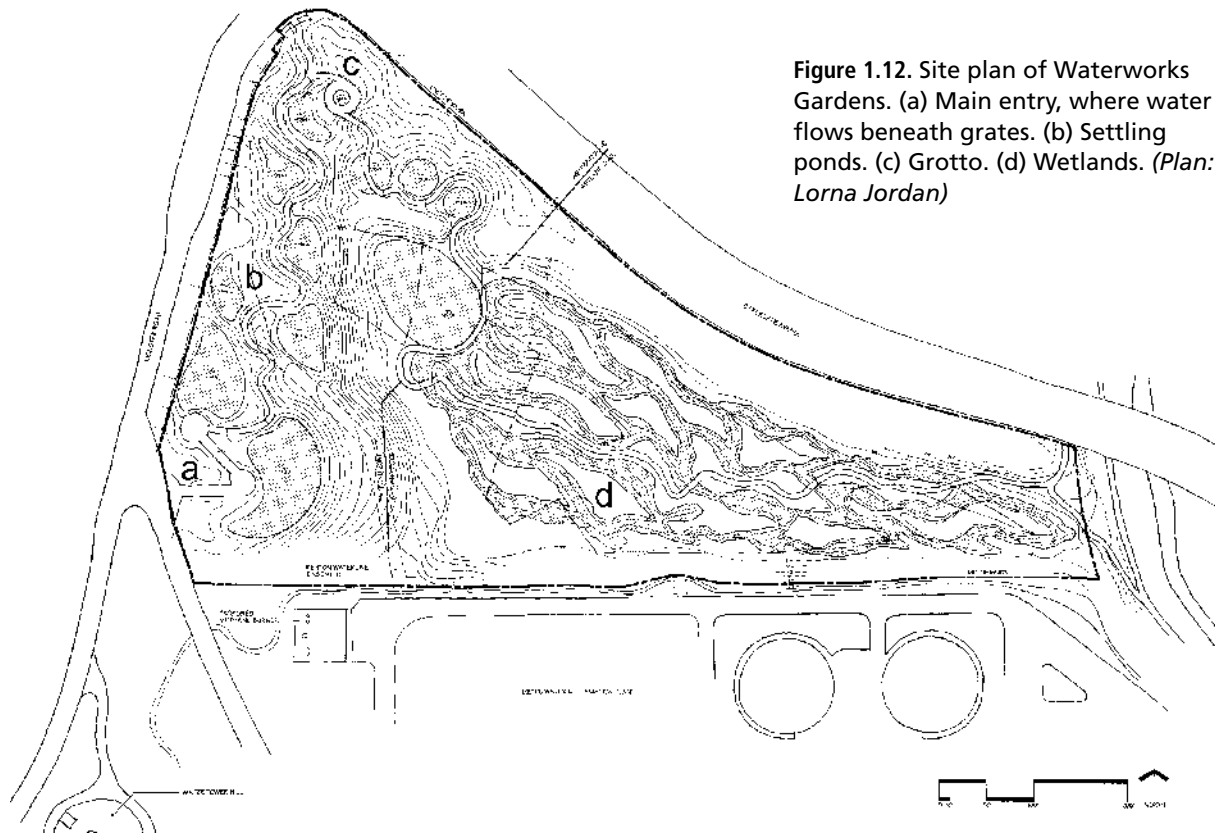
Site plan of Waterworks Gardens. (a) Main entry, where water flows beneath grates. (b) Settling ponds. (c) Grotto. (d) Wetlands. (Plan: Lorna Jordan)
